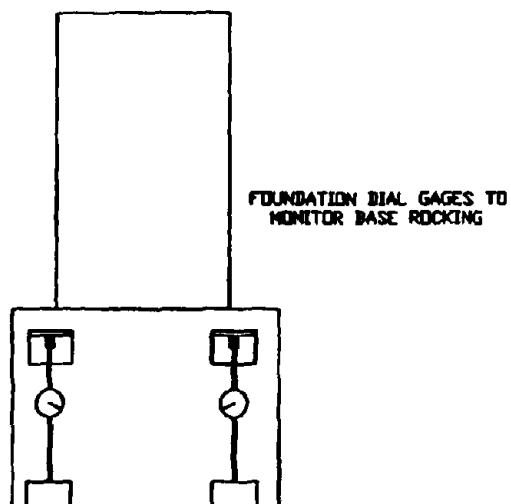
Instrumentation Detail for Measuring Base Rocking.
